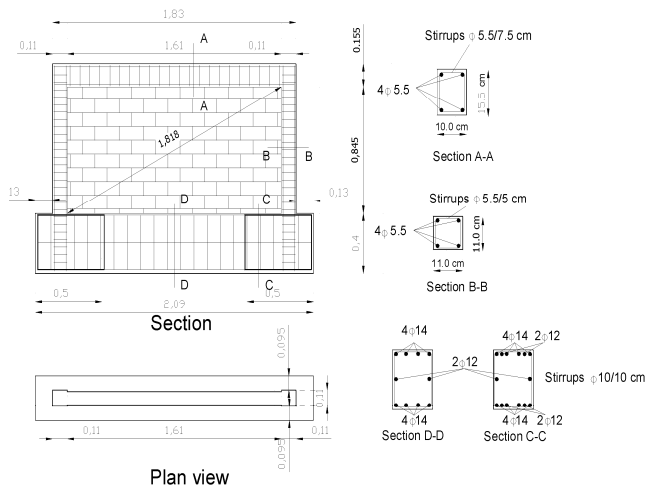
Masonry infilled R/C frame specimen F3N(R1f,0w)*s and design details [10].
